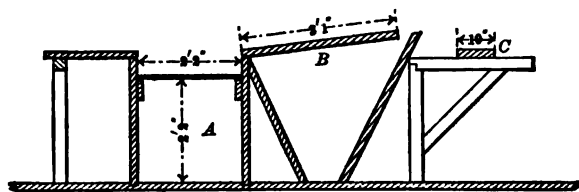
CROSS-SECTION OF WASHING BOX AND PICKING TABLE.
